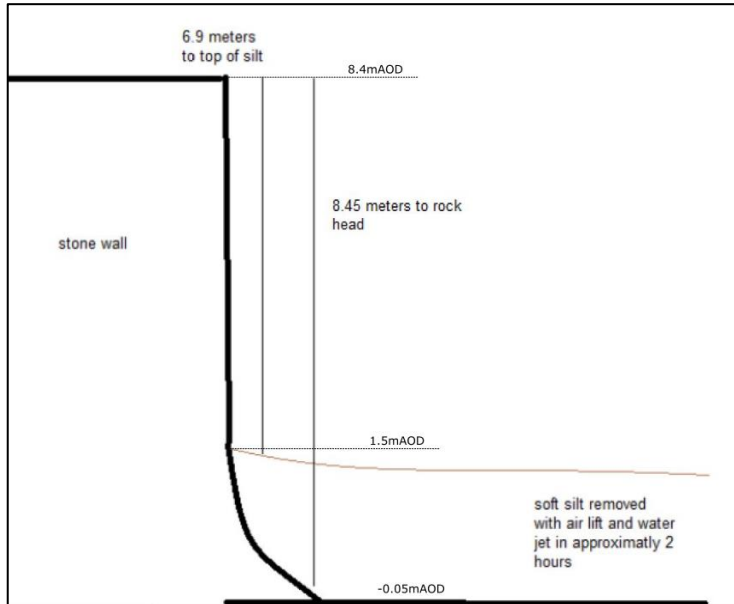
Indicative Cross-Section through the Southern Section of Harbour Wall
